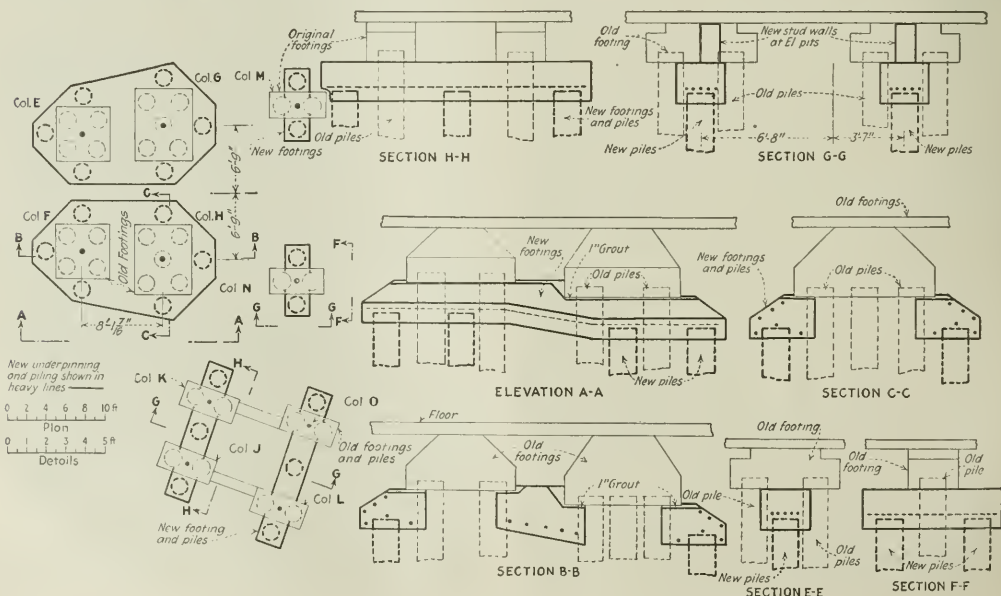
COLUMN FOOTINGS REINFORCED BY UNDERPINNING
